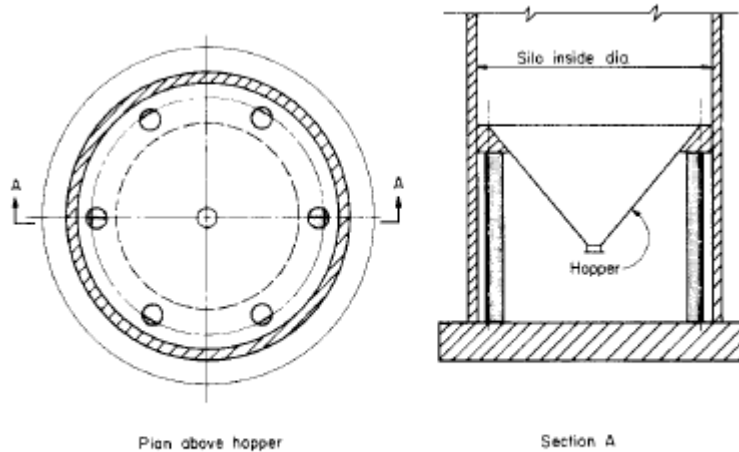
Silo bottom—steel hopper supported on concrete ring-beam-and-column system.
